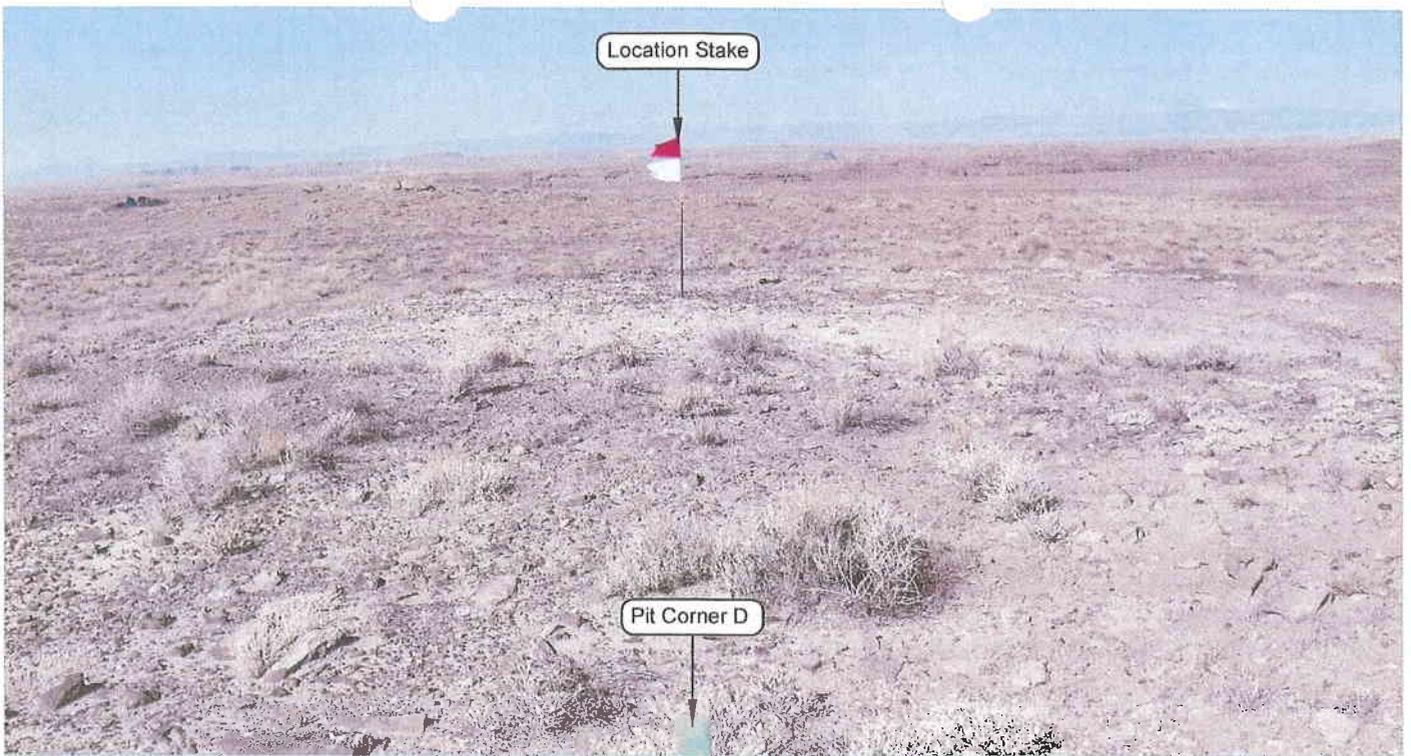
PHOTO VIEW: FROM PIT CORNER D TO LOCATION STAKE
